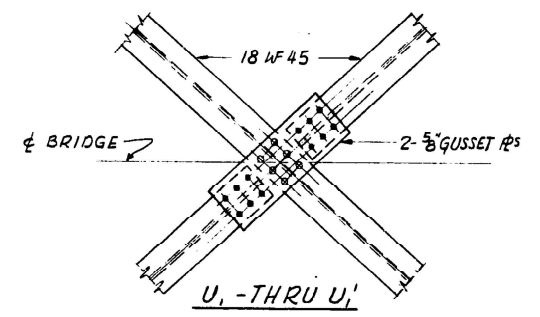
DETAIL AT U₁ FOR FUTURE U₀-U₁ CONNECTION
